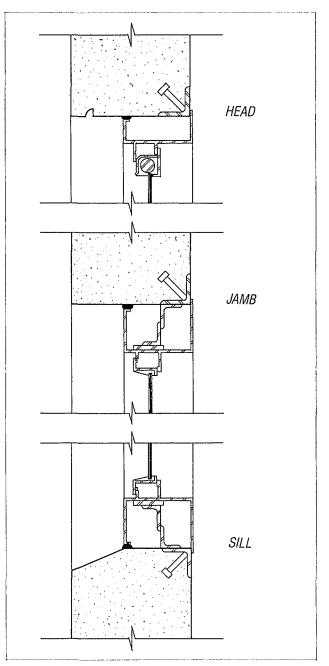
A security window is welded to cast-in-steel angles along the blocked out rough opening.
